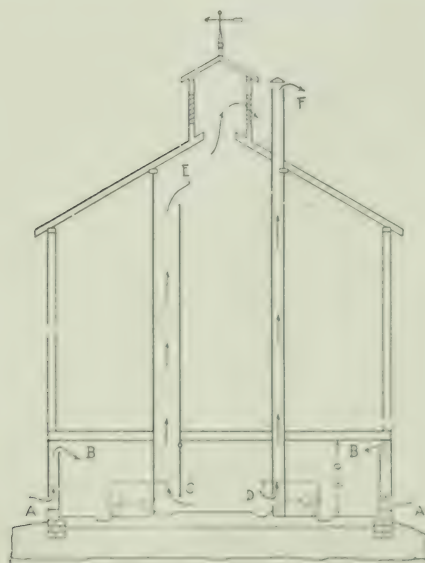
Showing method of utilizing a hay chute as an outtake.
